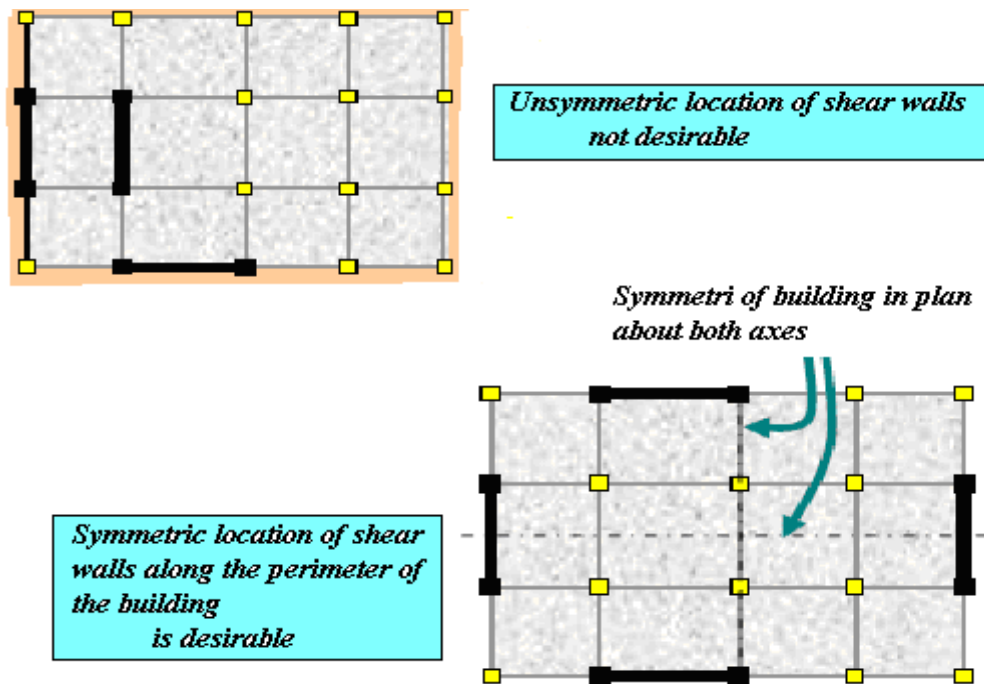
The plan distribution of Structural Walls (source: Murty 2004)
